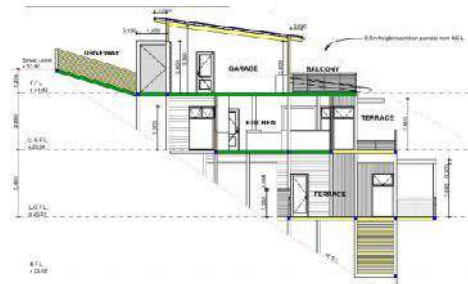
Western view of the property which shows the driveway providing access off of First Avenue (DEM TECH, 2020)
